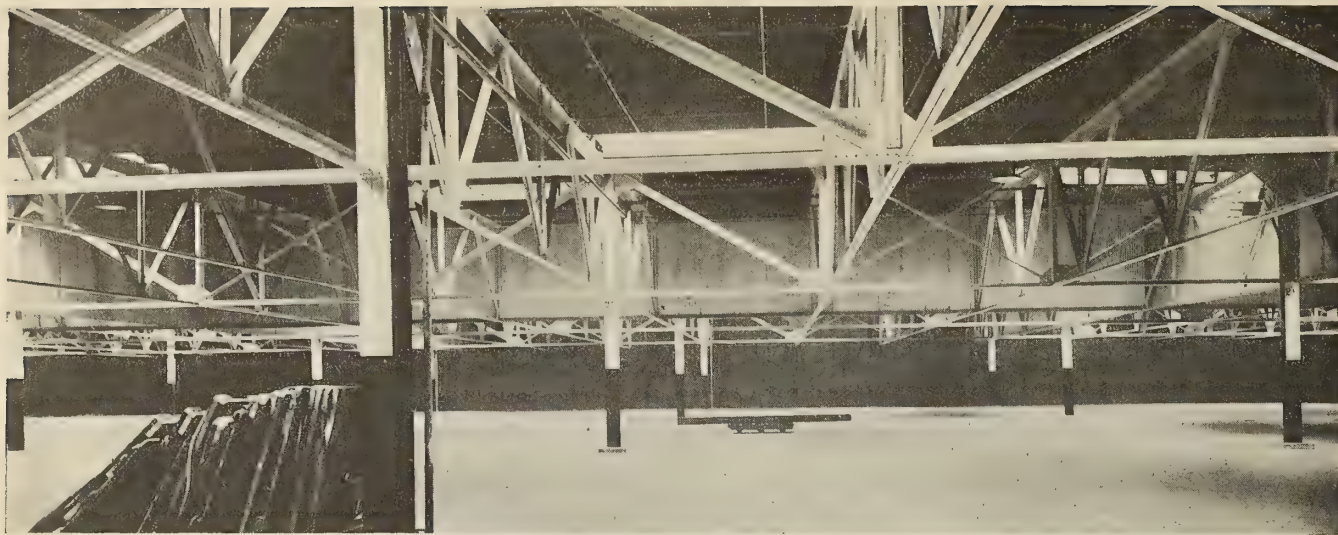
View of Brooklyn Pier Equipped with Automatic Sprinklers, Showing Curtain Board Extending Down the Center of the Pier
